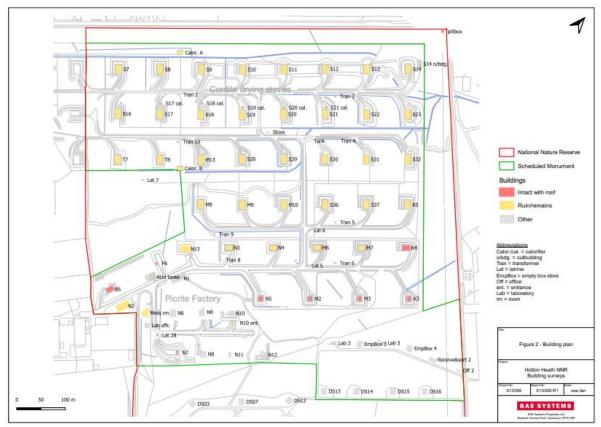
RNCF Holton Heath Building Plan (©BAE Systems).
